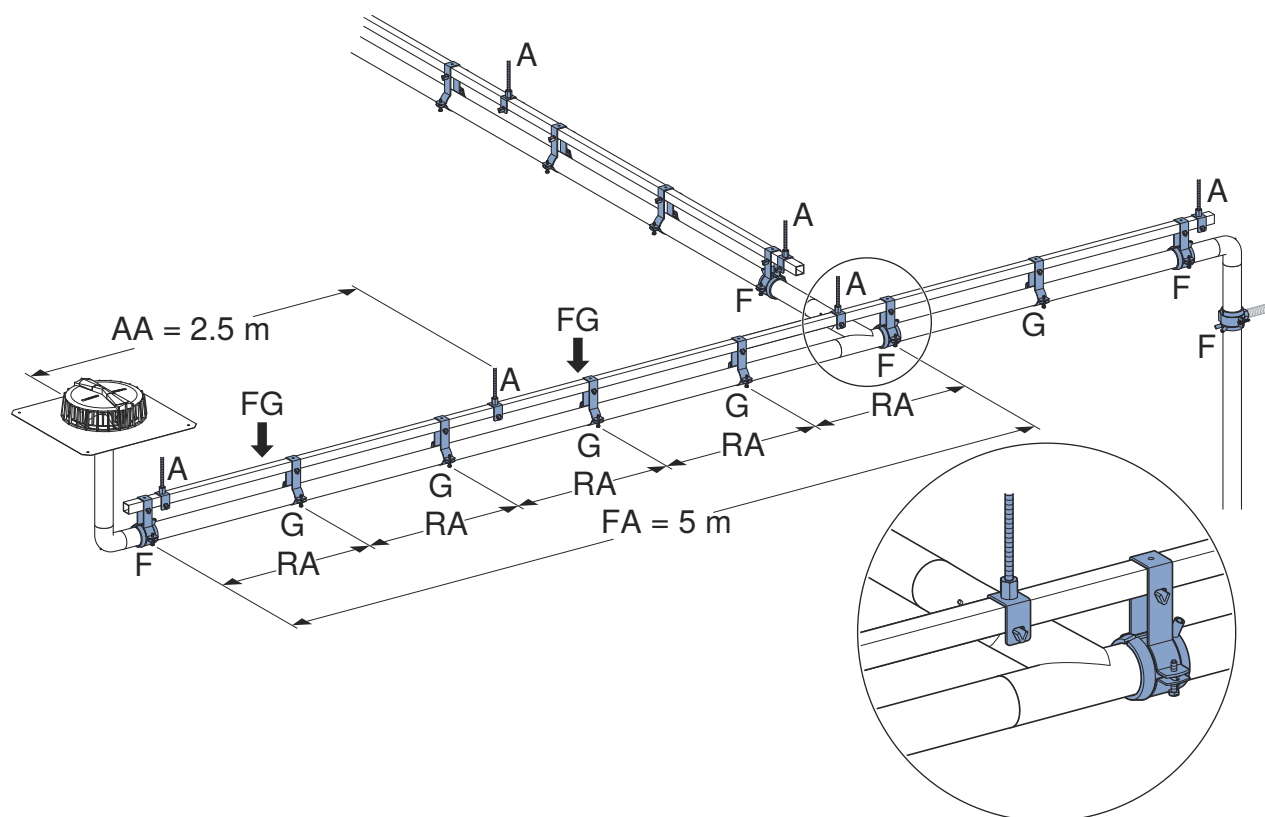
Fastening distances for Geberit Pluvia rail fastening systems without support shells
